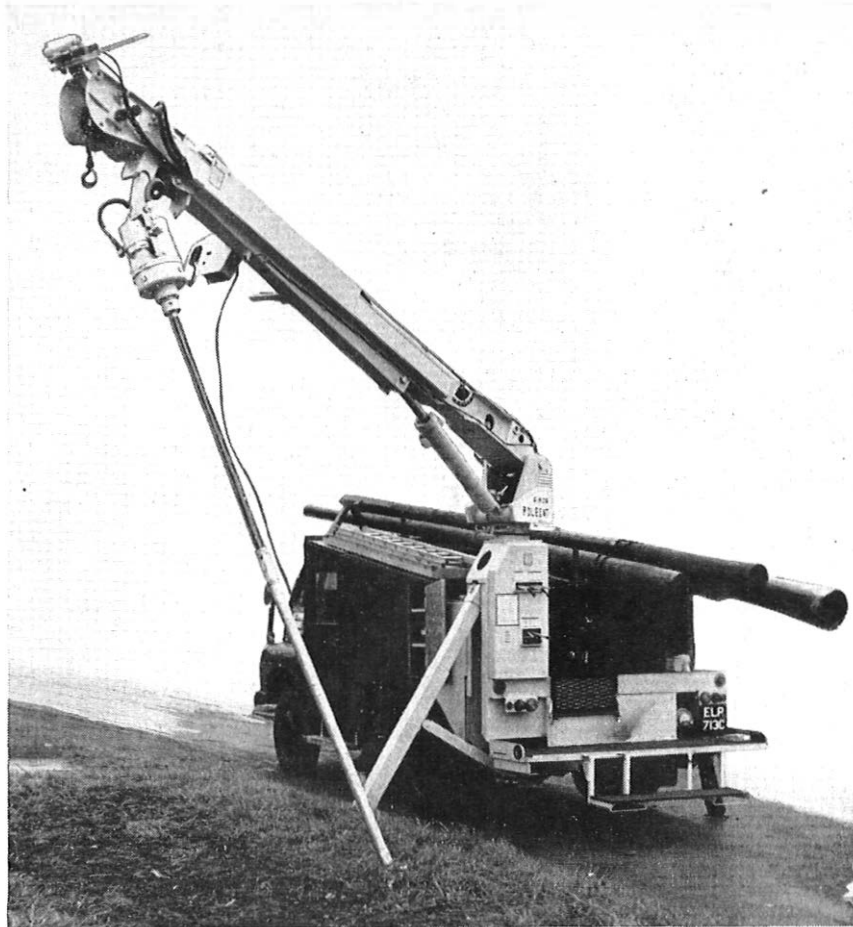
ADAPTOR FITTED TO DRIVE-SHAFT OF POLE-ERECTION UNIT
